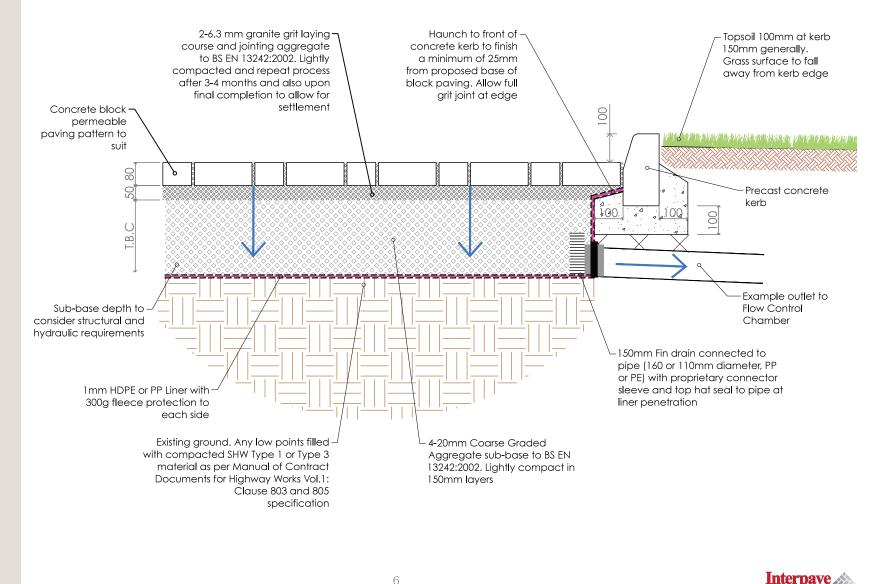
Permeable Paving (System B) with Partial Infiltration
